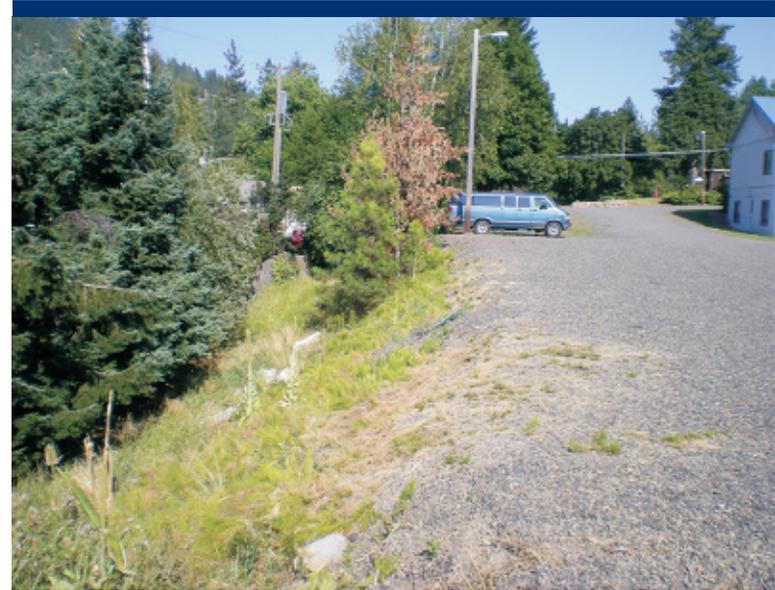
Church parking lot at 291 118th St. before construction of the wall.
